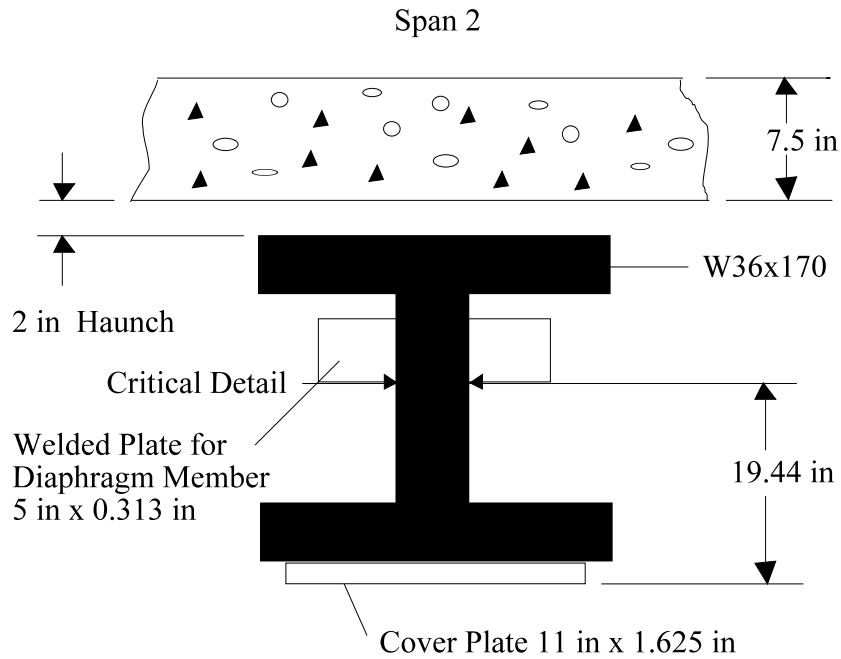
Welded Web Connection, Detail No. 2
